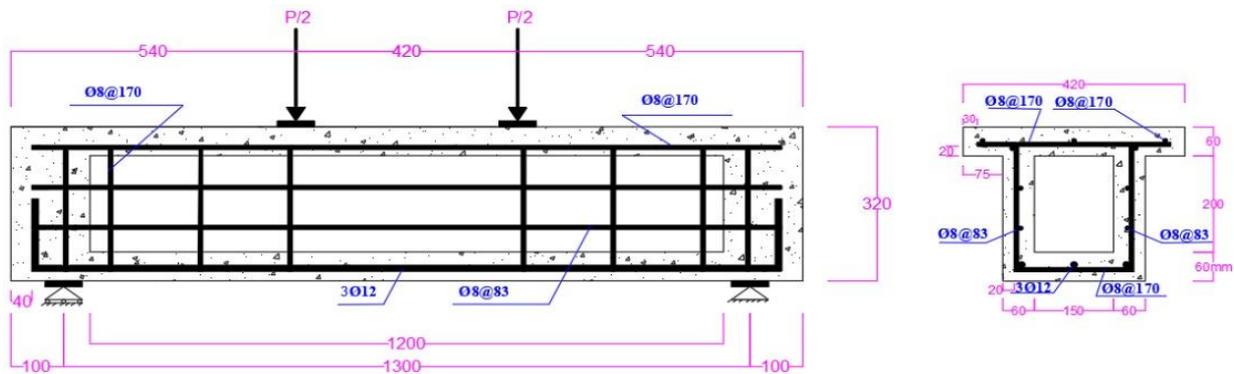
Dimensions and reinforcement details of (BRVS) (all units are in mm)
